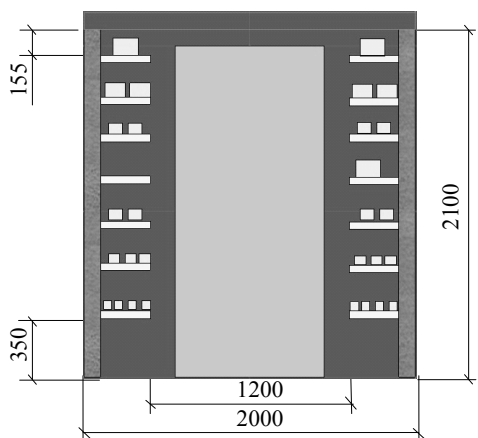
Standard cable arrangement in tunnels and collectors with a rectangular cross-section [1]
